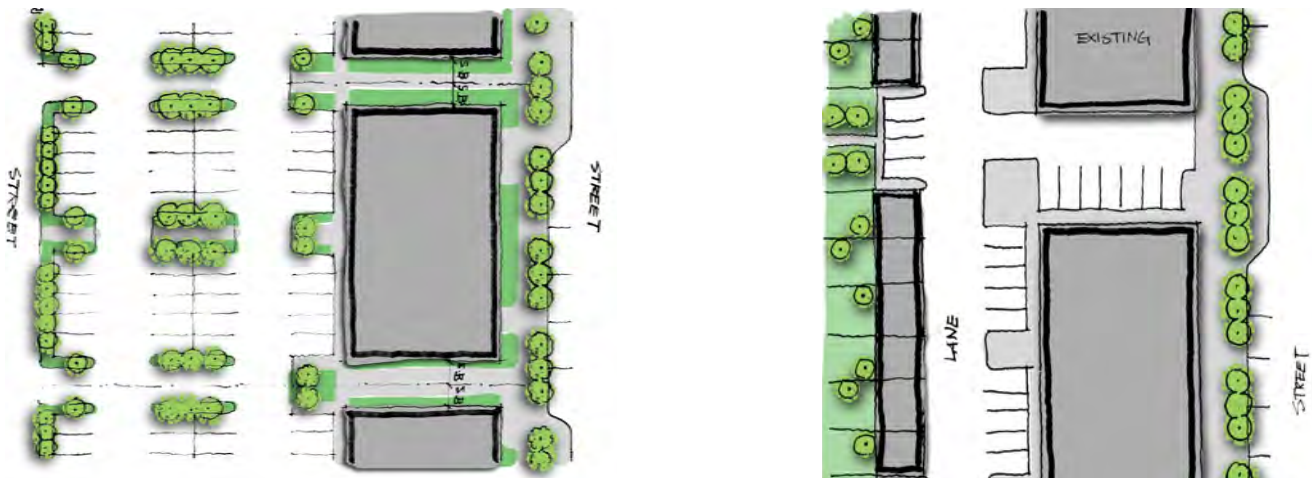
Industrial Arts - Plan View - Example Parking Interface Alternatives (4.6.4)
